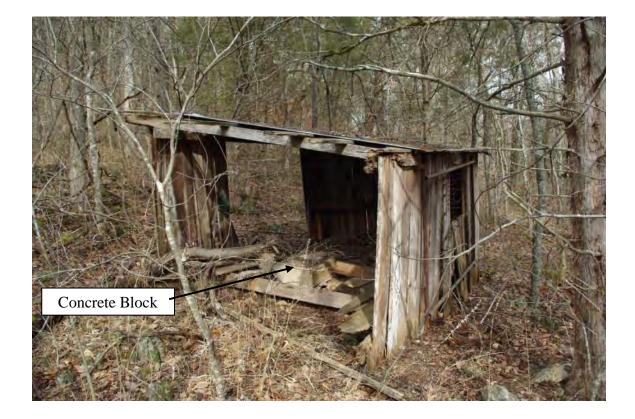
Building 5, Pole Shed Facing Northwest Photo 40: Building 5, Pole Shed Facing Southeast
